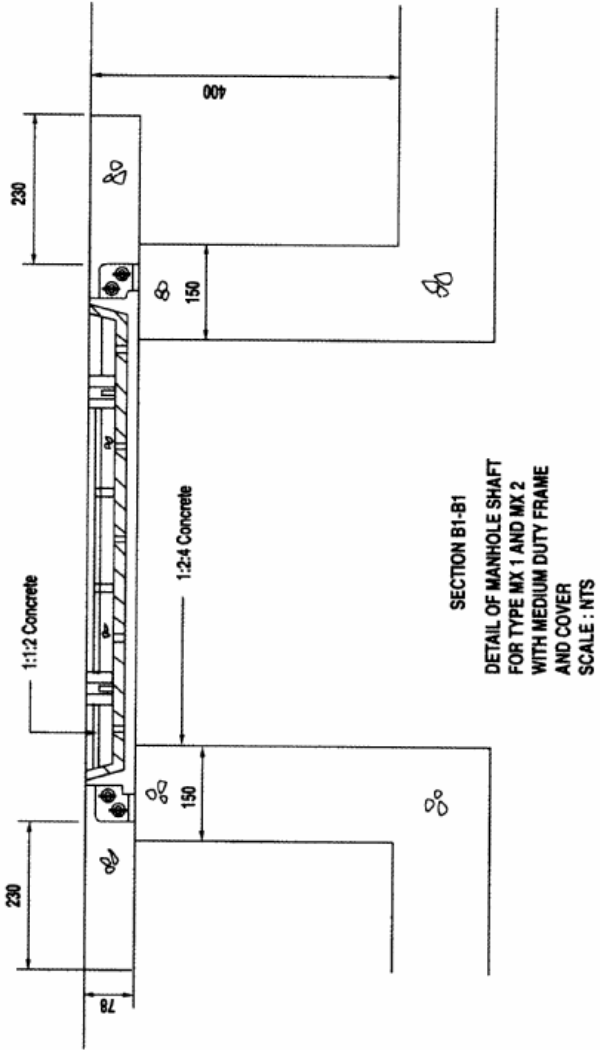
Manhole Drawings – Type MX1 & MX2
